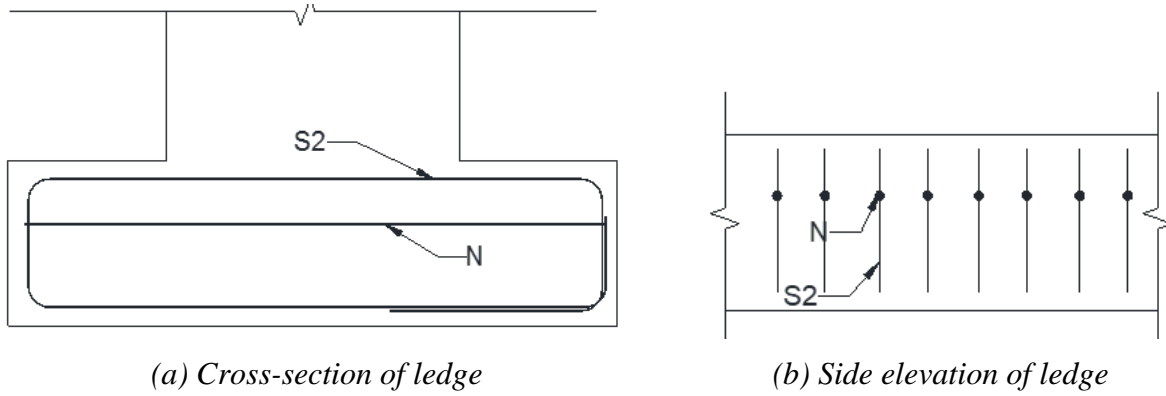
Ledge Reinforcement Detail of Typical Double-Column Bent.
